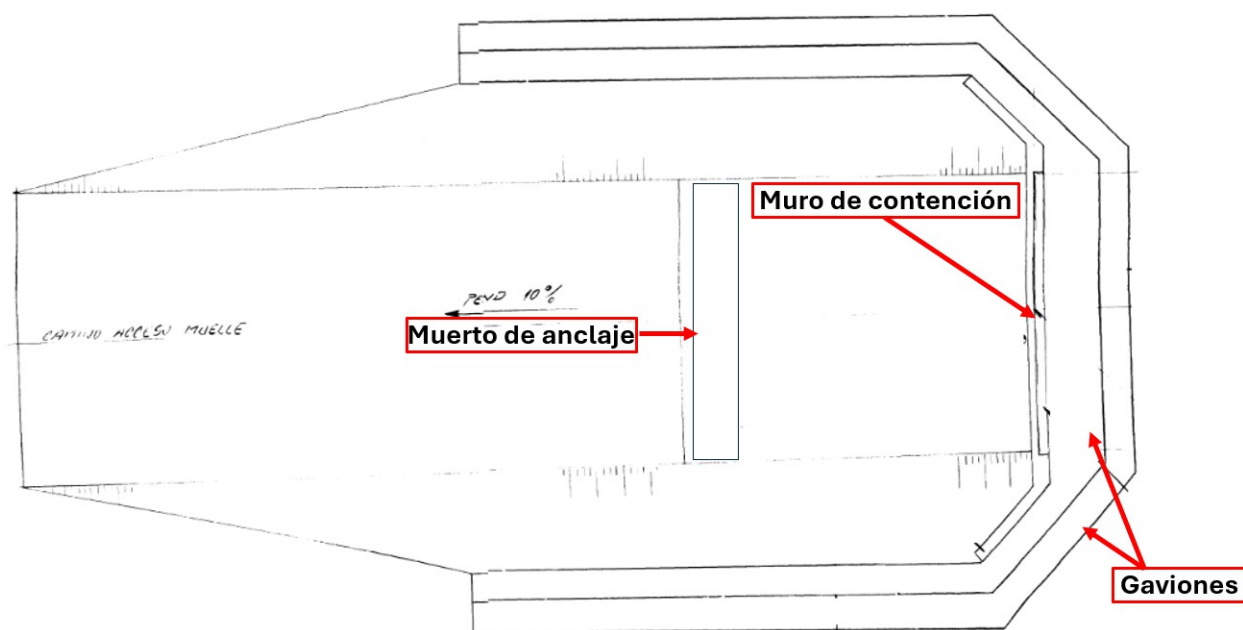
Schematic plan (right) of structural elements of the abutment
